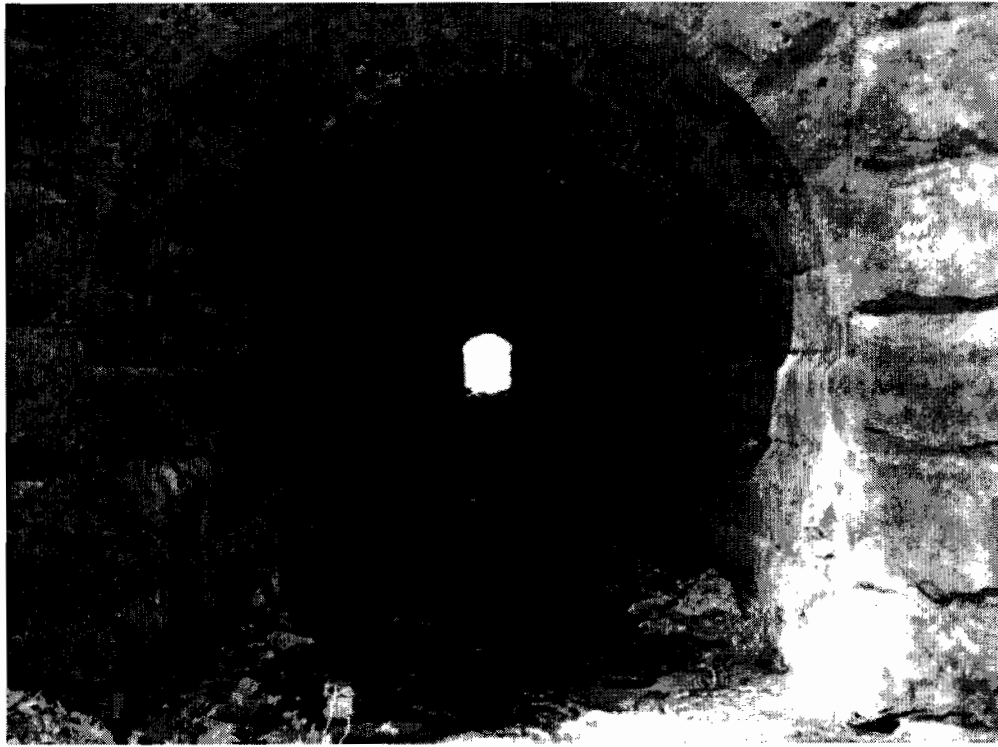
Looking west from the entrance arch showing the brick arch barrel.
